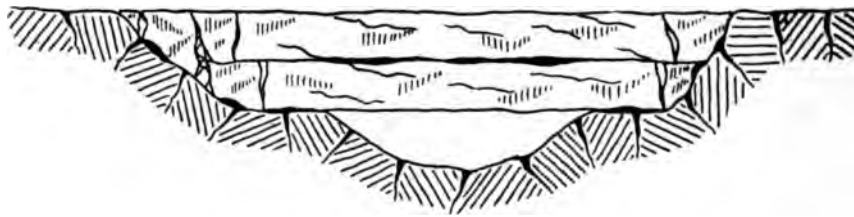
STONE BEAM BRIDGE. EGYPT.
